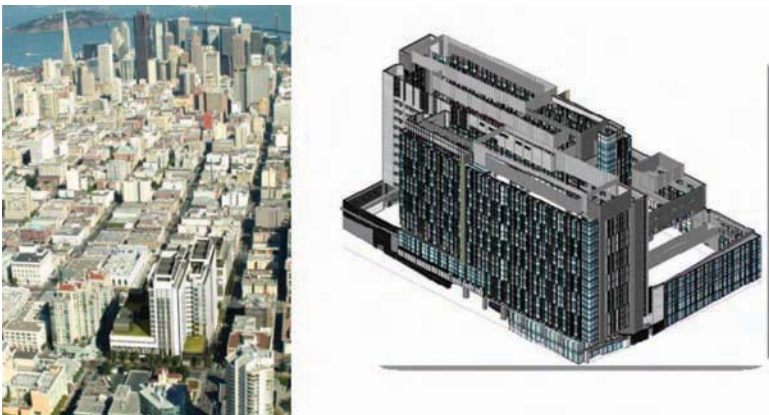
Drawing of the building and its proposed location in San Francisco.
